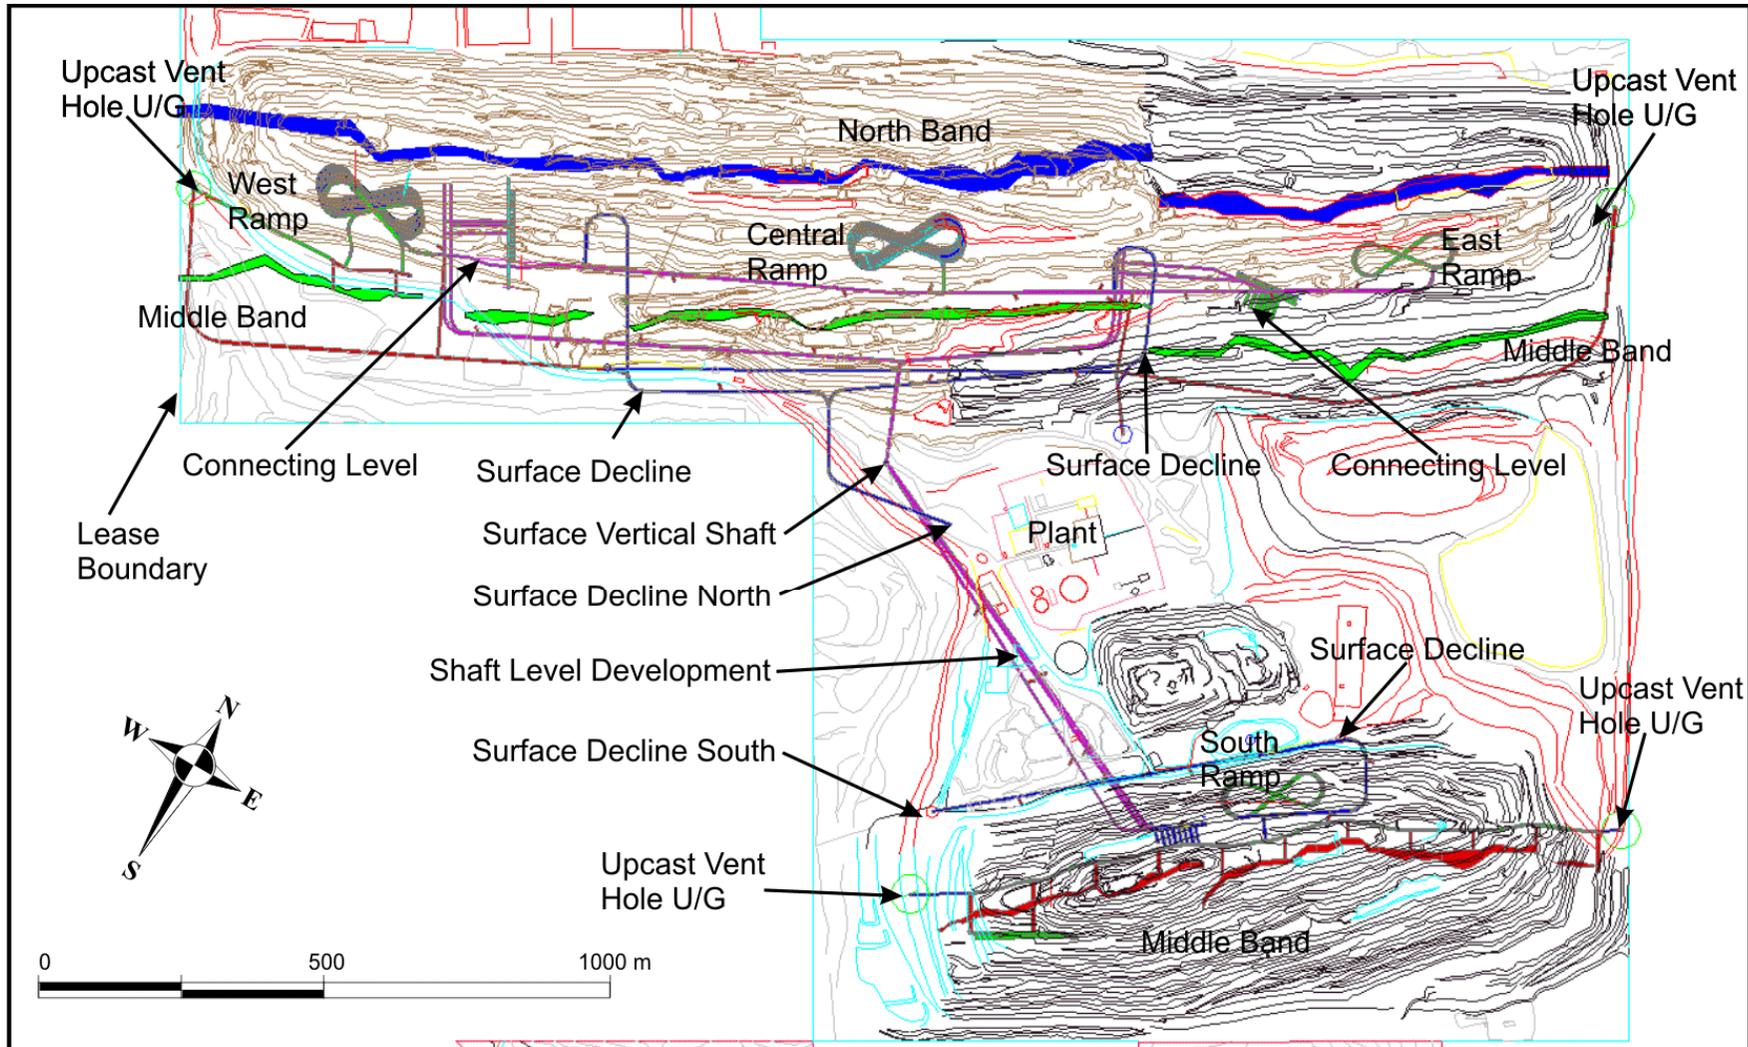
Schematic Plan View of Mine Entries for Underground Mine
